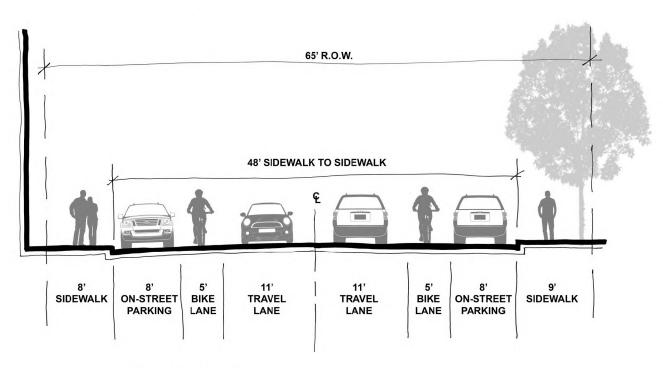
AVERILL STREET / ALEXANDER STREET SECTION
